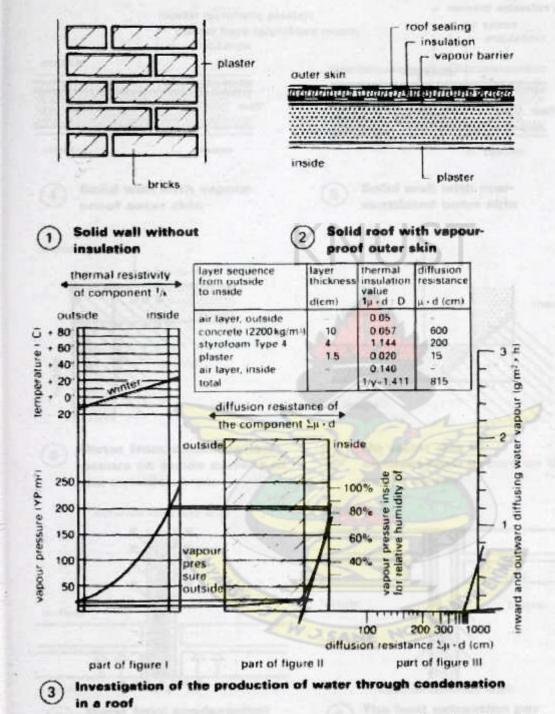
Sections through walls showing construction with and without insulation and condensation of vapour in a roof
